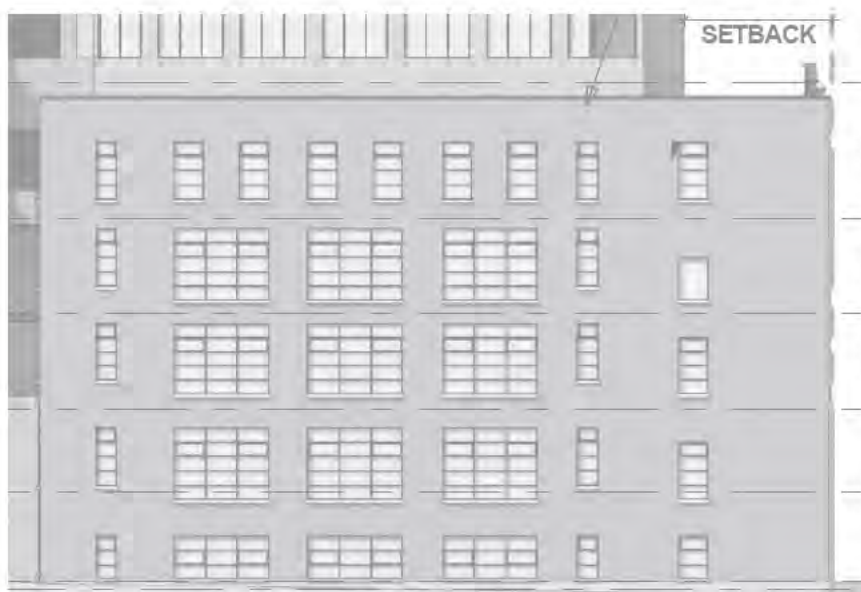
Proposed south elevation (Wallman Architects, 2024; annotated by ERA).
